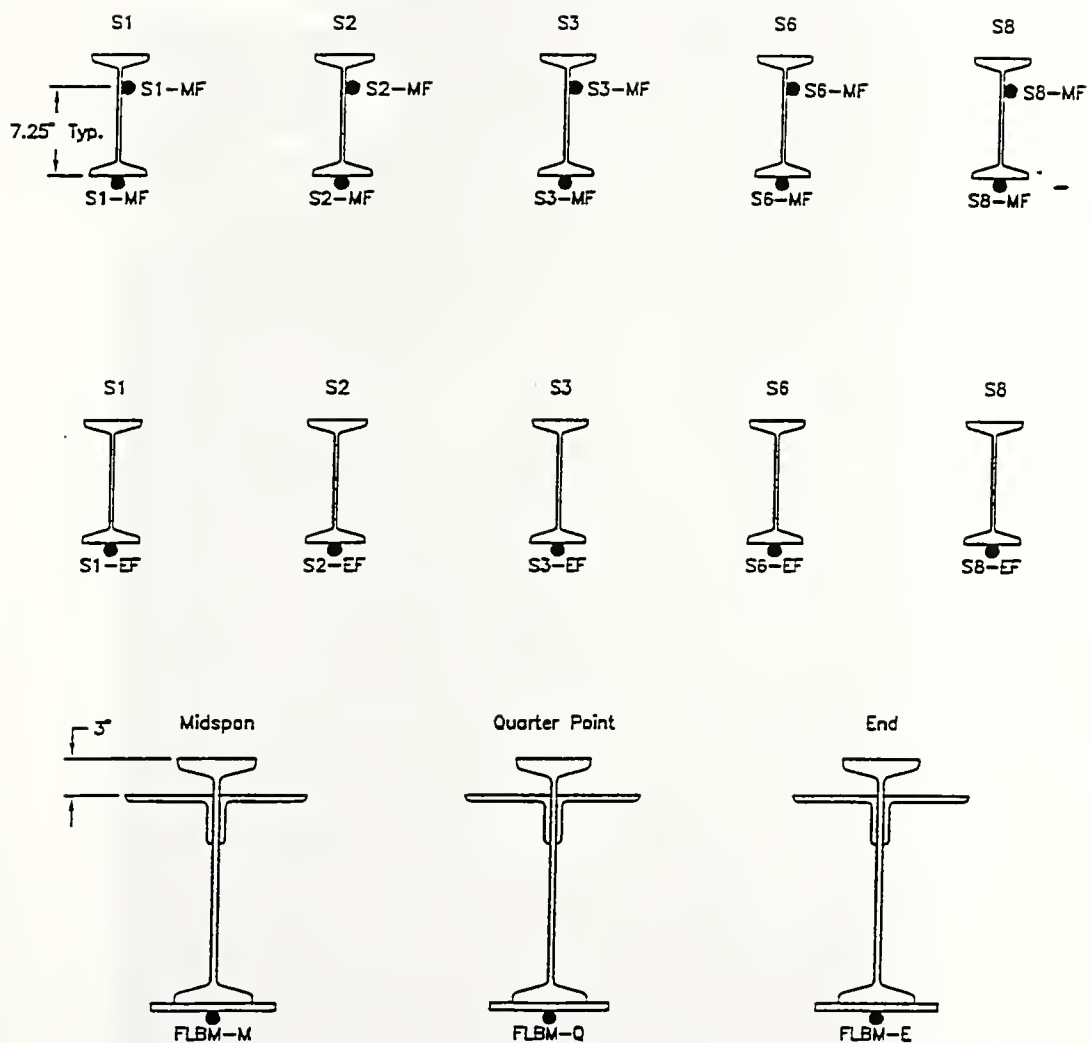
Panel 3 deck strain gage locations and identification
